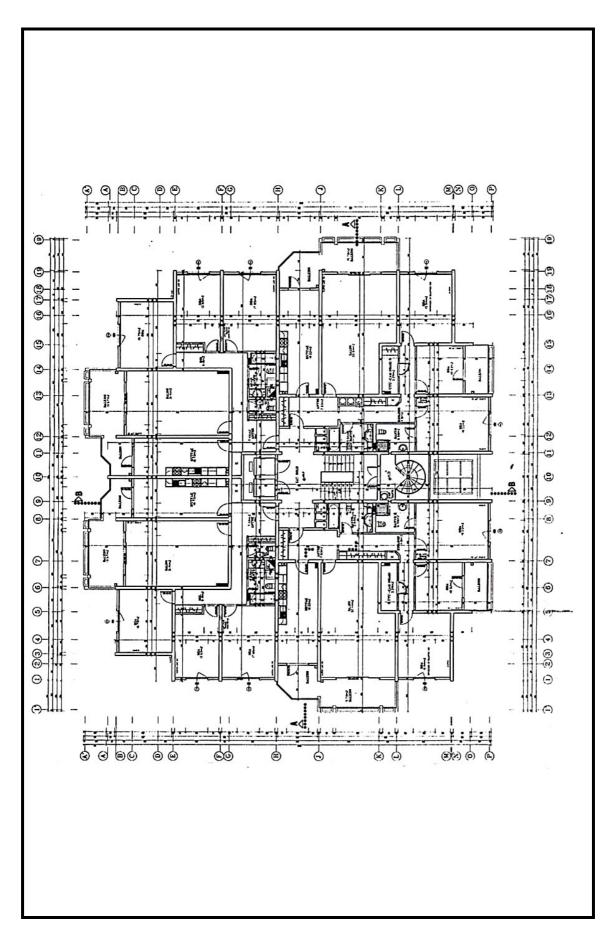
Mavişehir II; Flamingo 14th-Floor Plan
